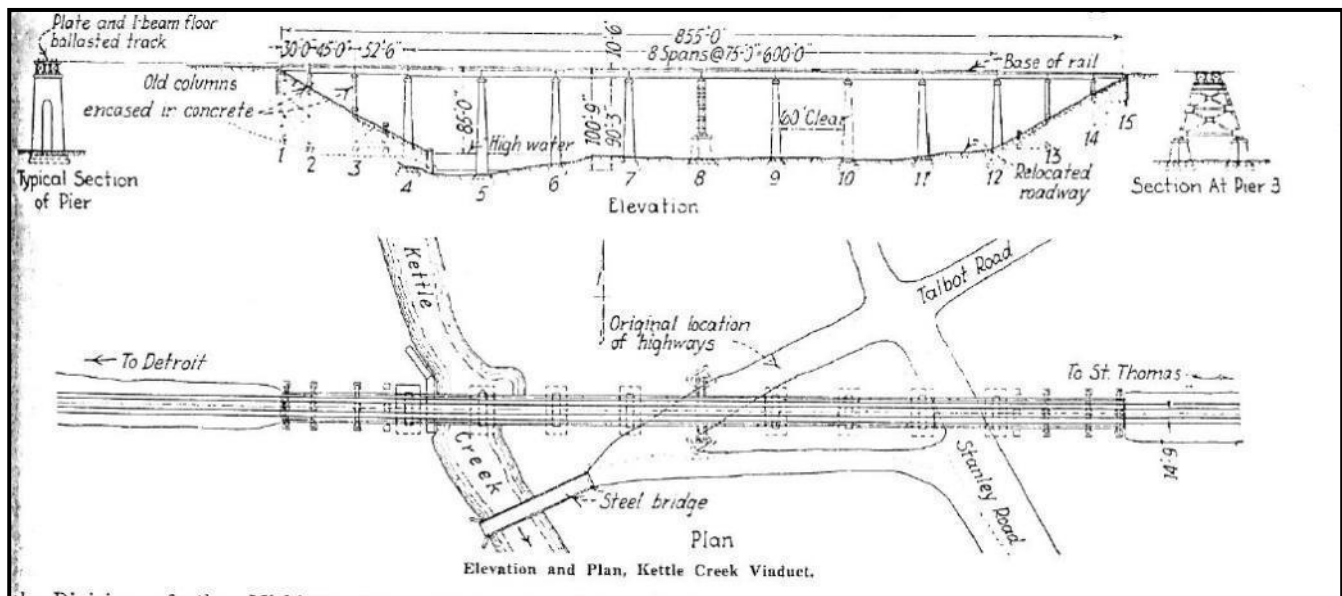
Plan and Elevation of bridge. Source Canadian Railway and Marine World
